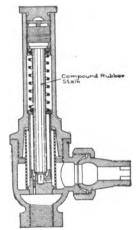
Thermostat Attached to Angle-Valve with Top Removed.
